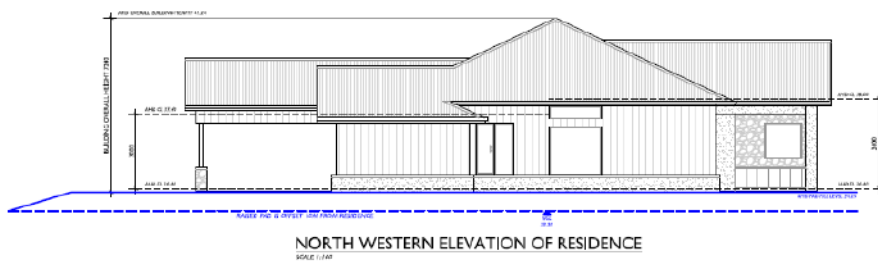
Extract Elevation Plans Jackson and Fapio Pty Ltd
